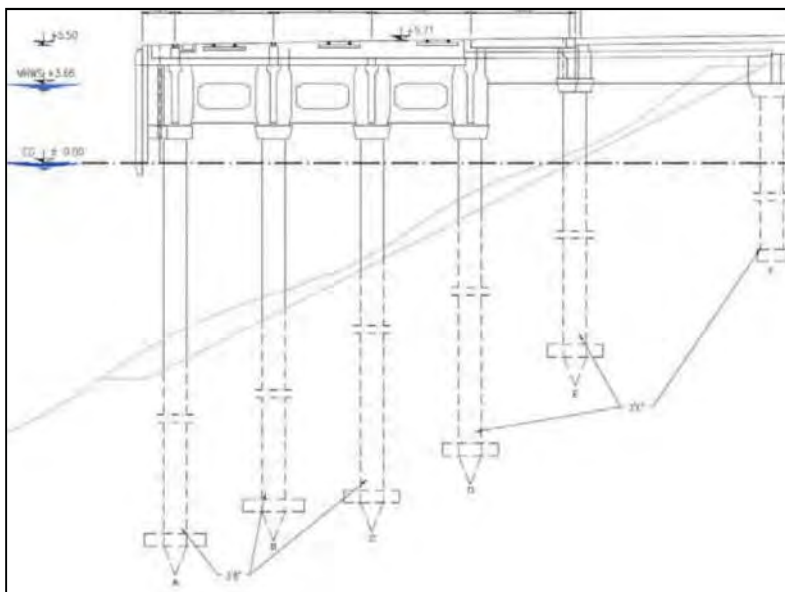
Cross section through Berths 9 and 10 (original design)
